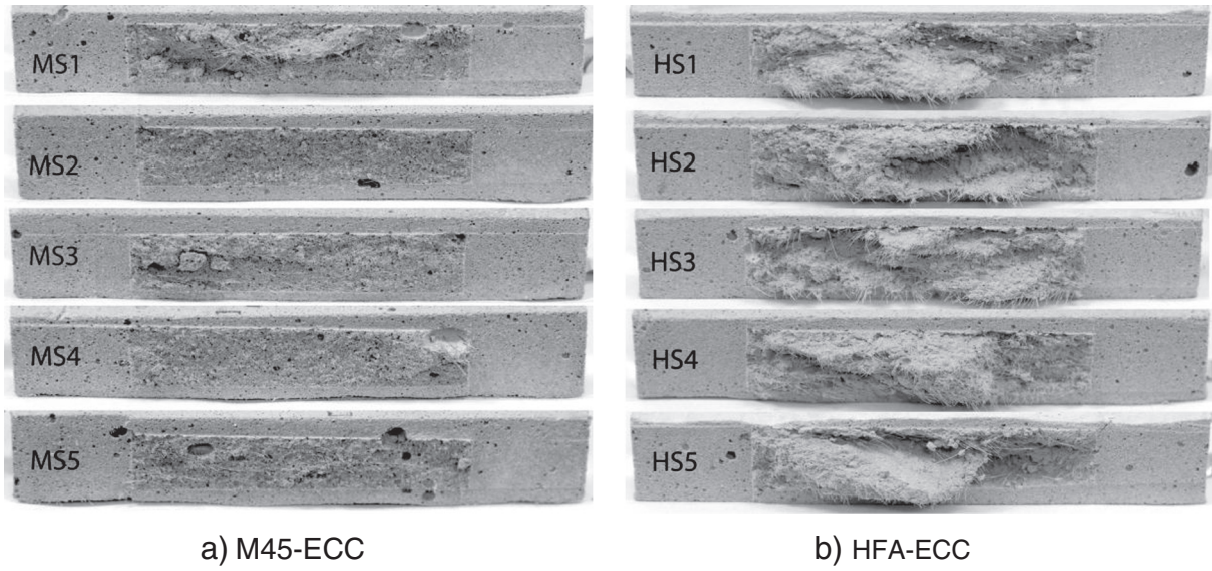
Cracked cross-sections of single-crack coupon specimens of (a) M45-ECC and (b) HFA-ECC after direct tension tests.
